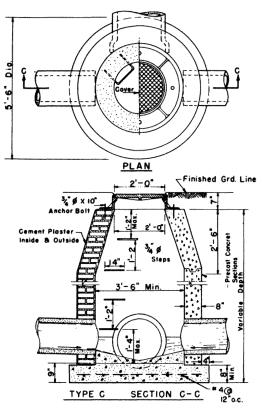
A suggested manhole design. (Source: Reference 1)
